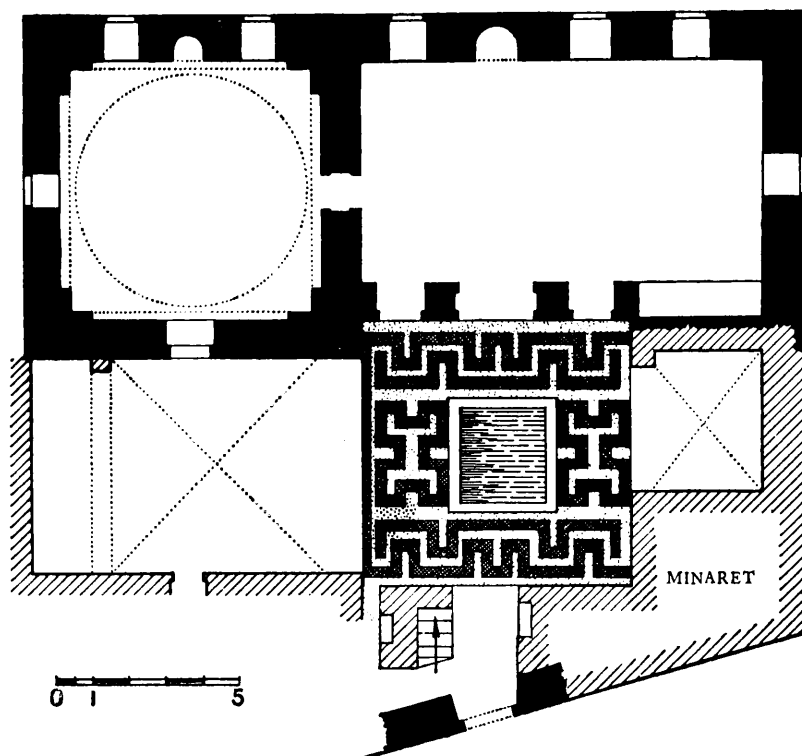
MADRASA MÂRIDÂNIYA : plan.
